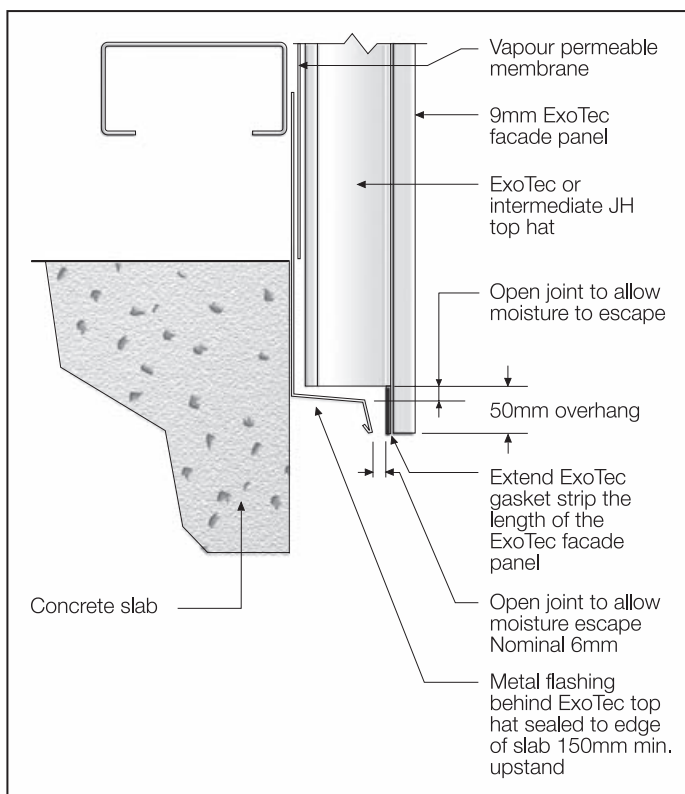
WALL BASE TYPICAL DETAIL 1
